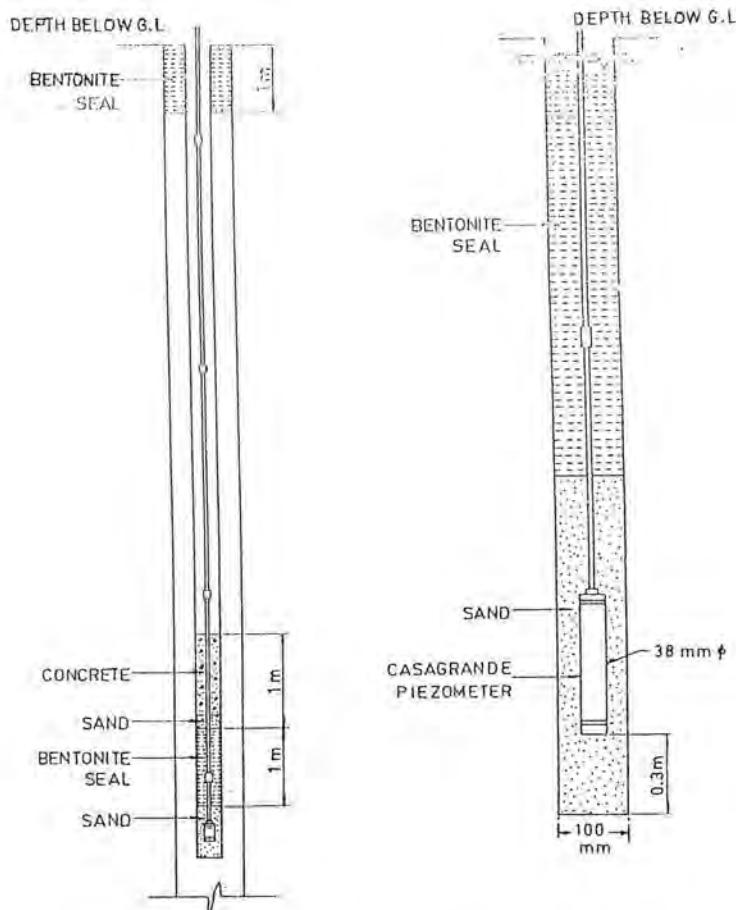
Installation Details of Open Stand Pipe Piezometer
